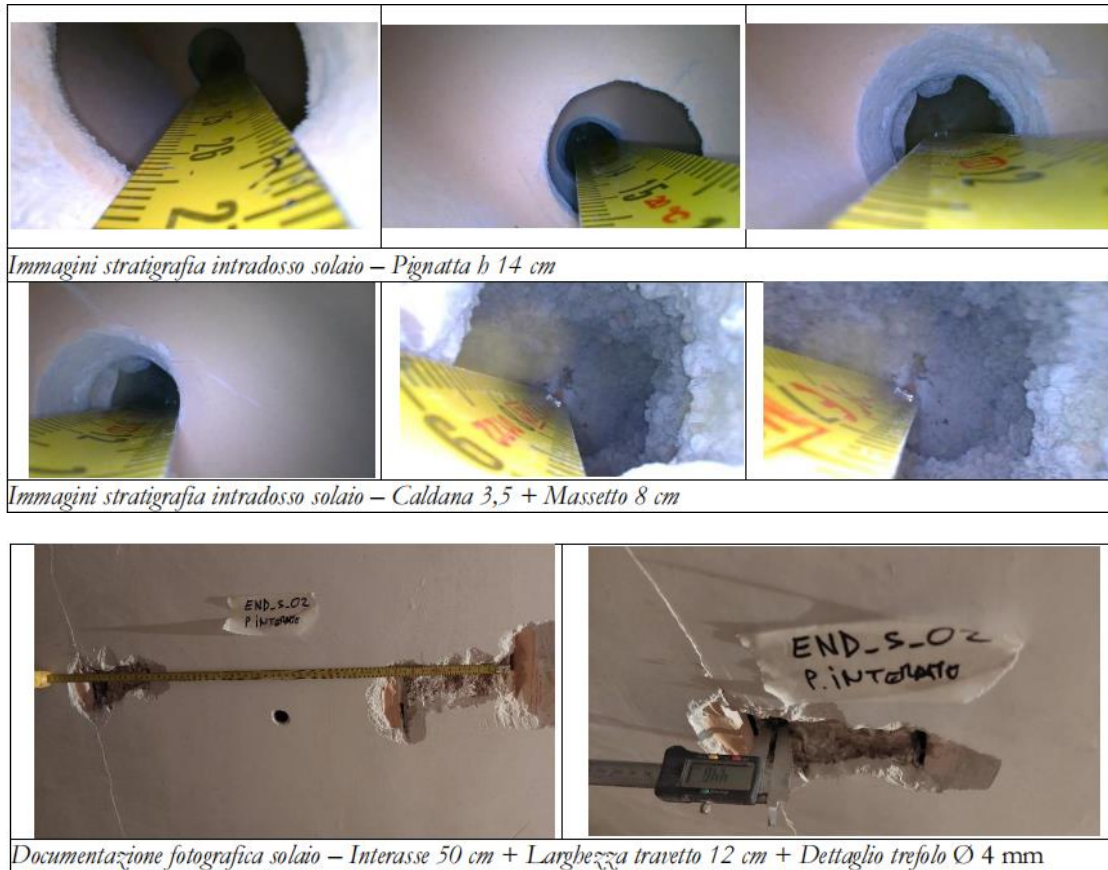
layers measurement\_Underground ceiling (END\_S\_02)
